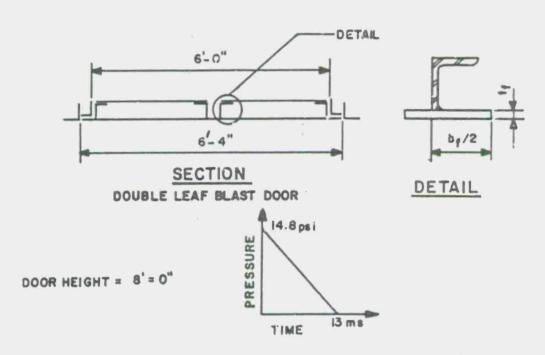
A-7 (a) Door configuration and loading, Example 5A-7(a)
